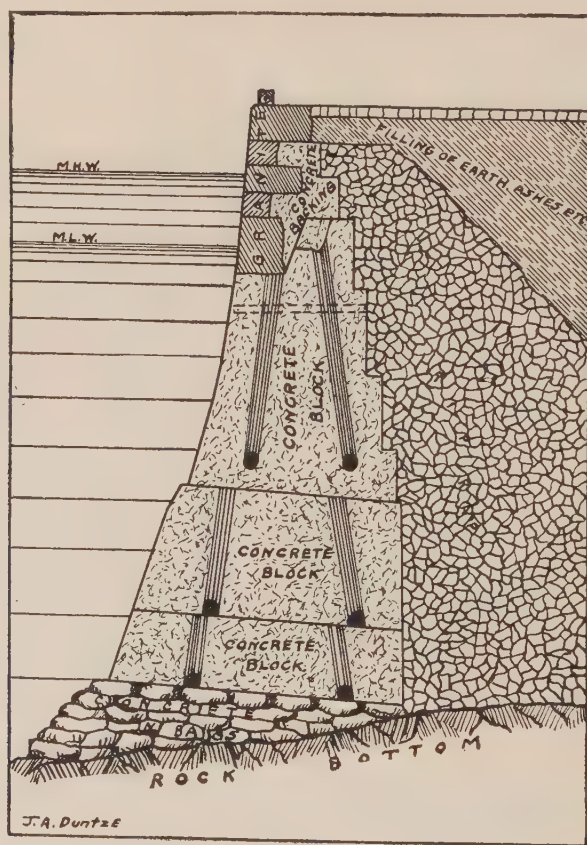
BULKHEAD WALL ON ROCK FOUNDATION, NEW YORK, N. Y.
